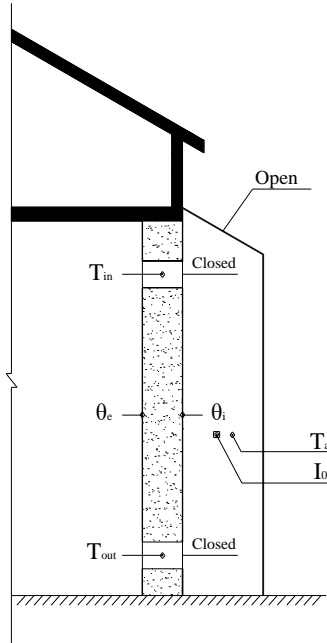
Schematic diagram of the section of the concrete collector wall.
